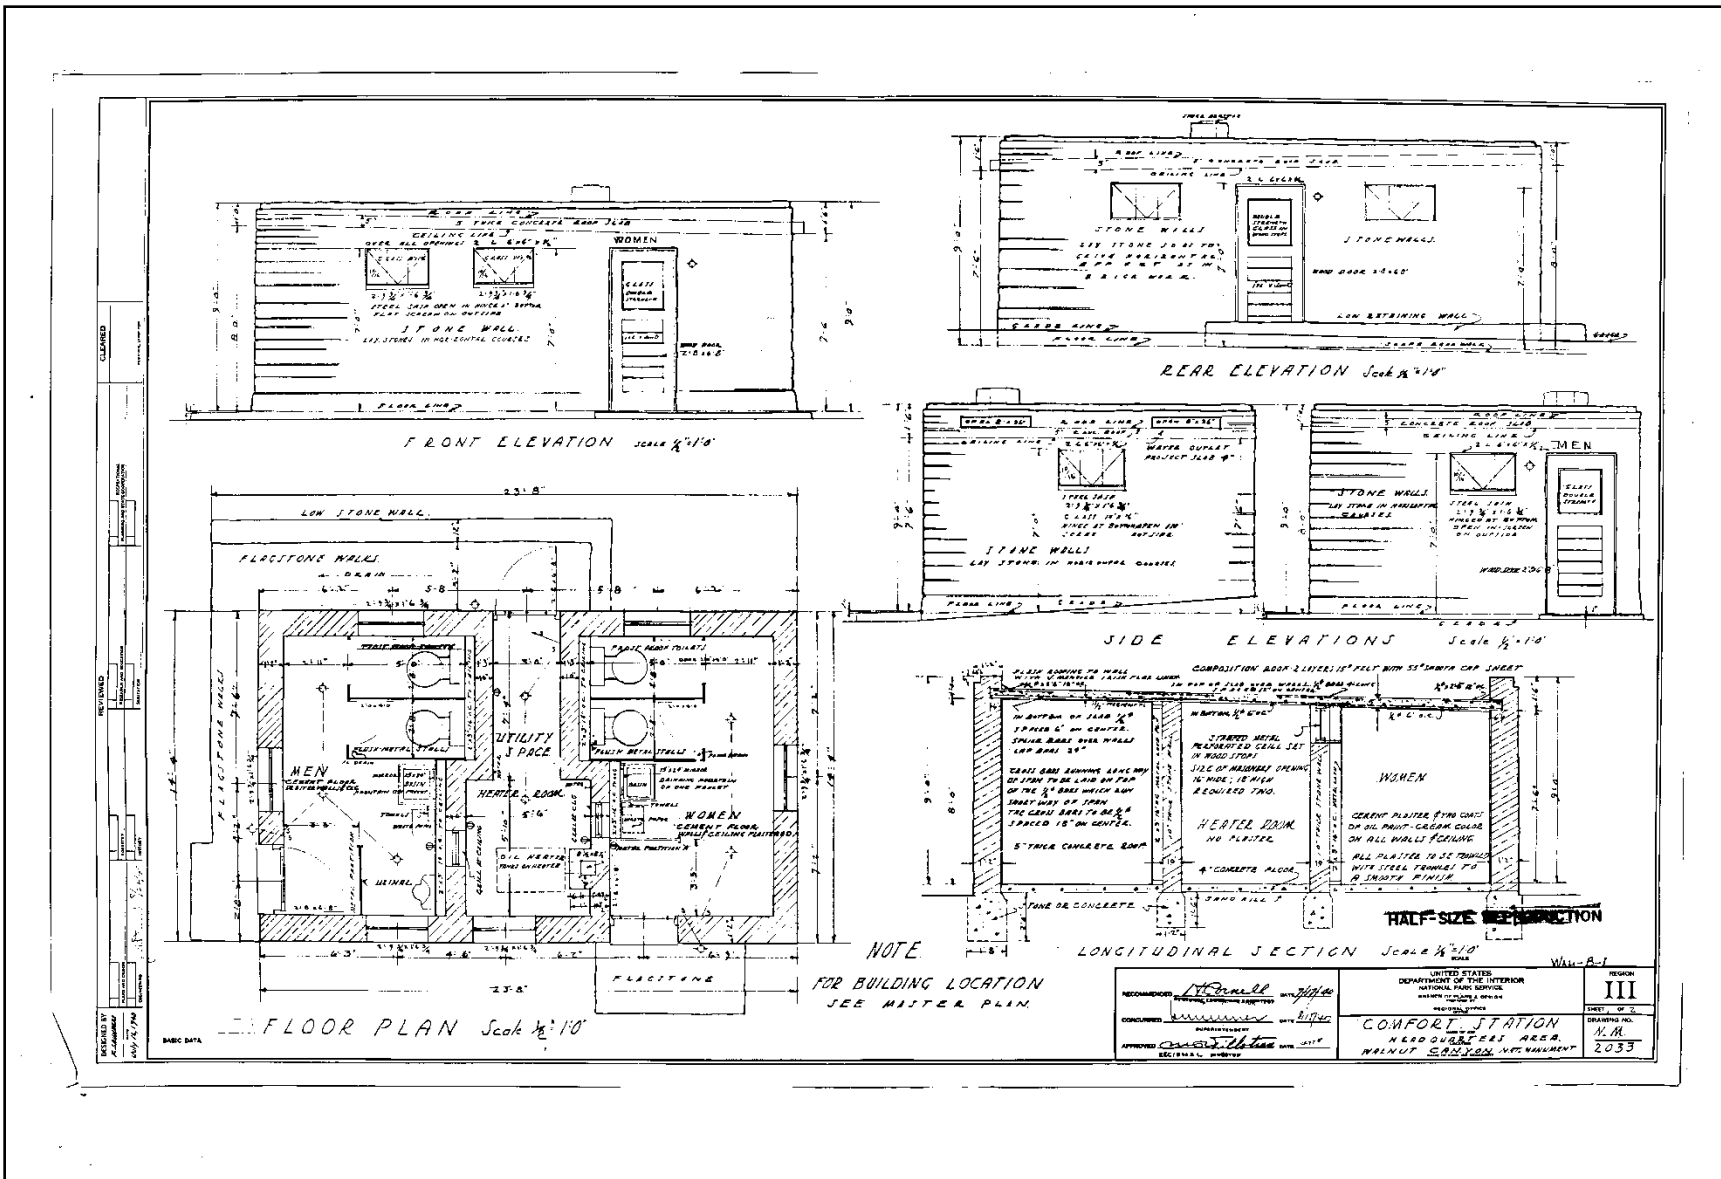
Building plan for Comfort Station (NPS Dwg NM-2033), 1940.
